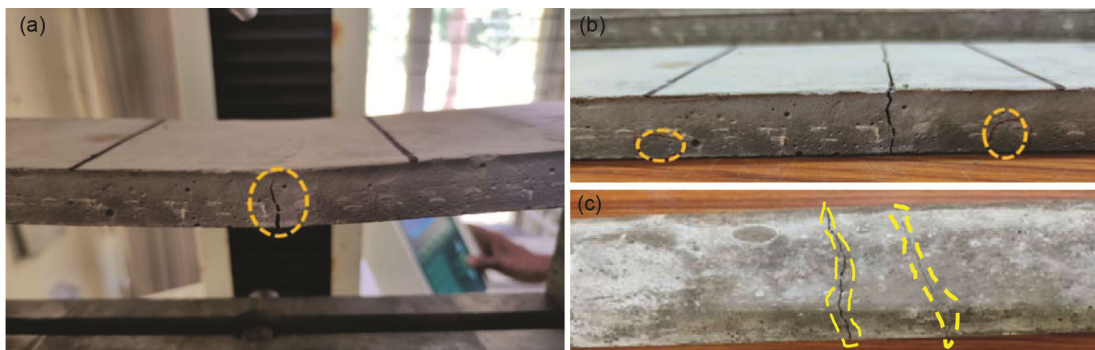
(a) Crack propagating from bottom, (b) Minor cracks formed, Cracks formed at bottom surface
